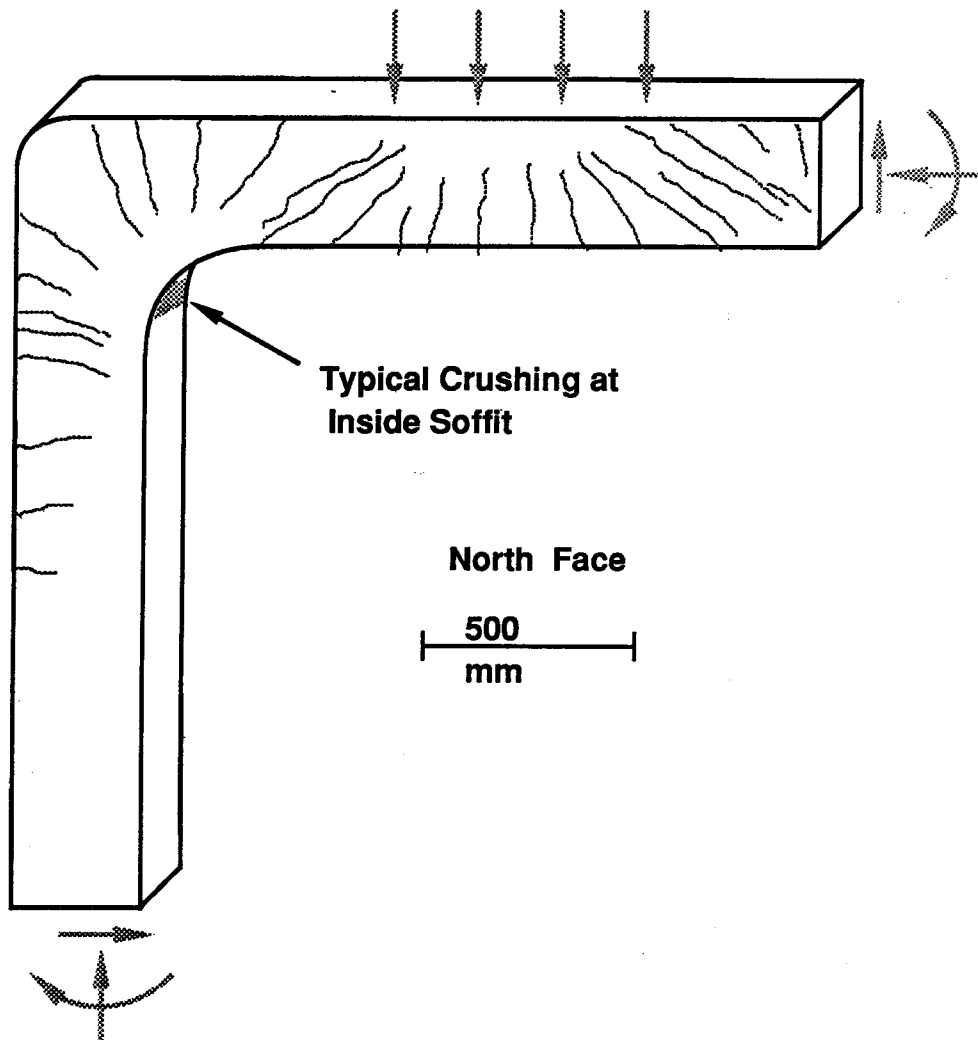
Typical Crack Pattern and Damage Zones for B-Series Specimens
